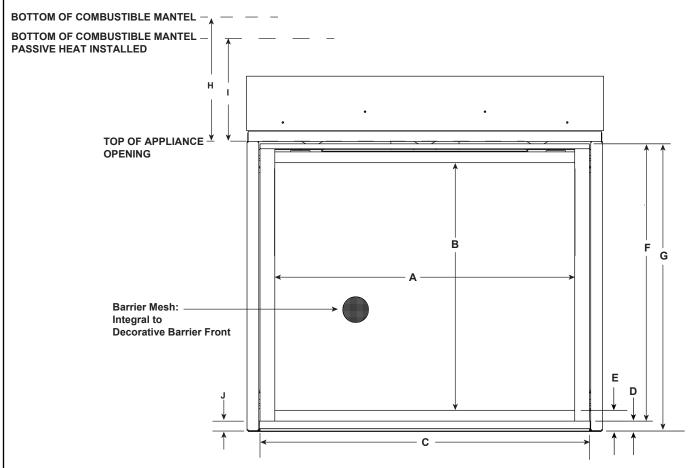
Decorative Barrier Front Dimensions - ENSEMBLE
